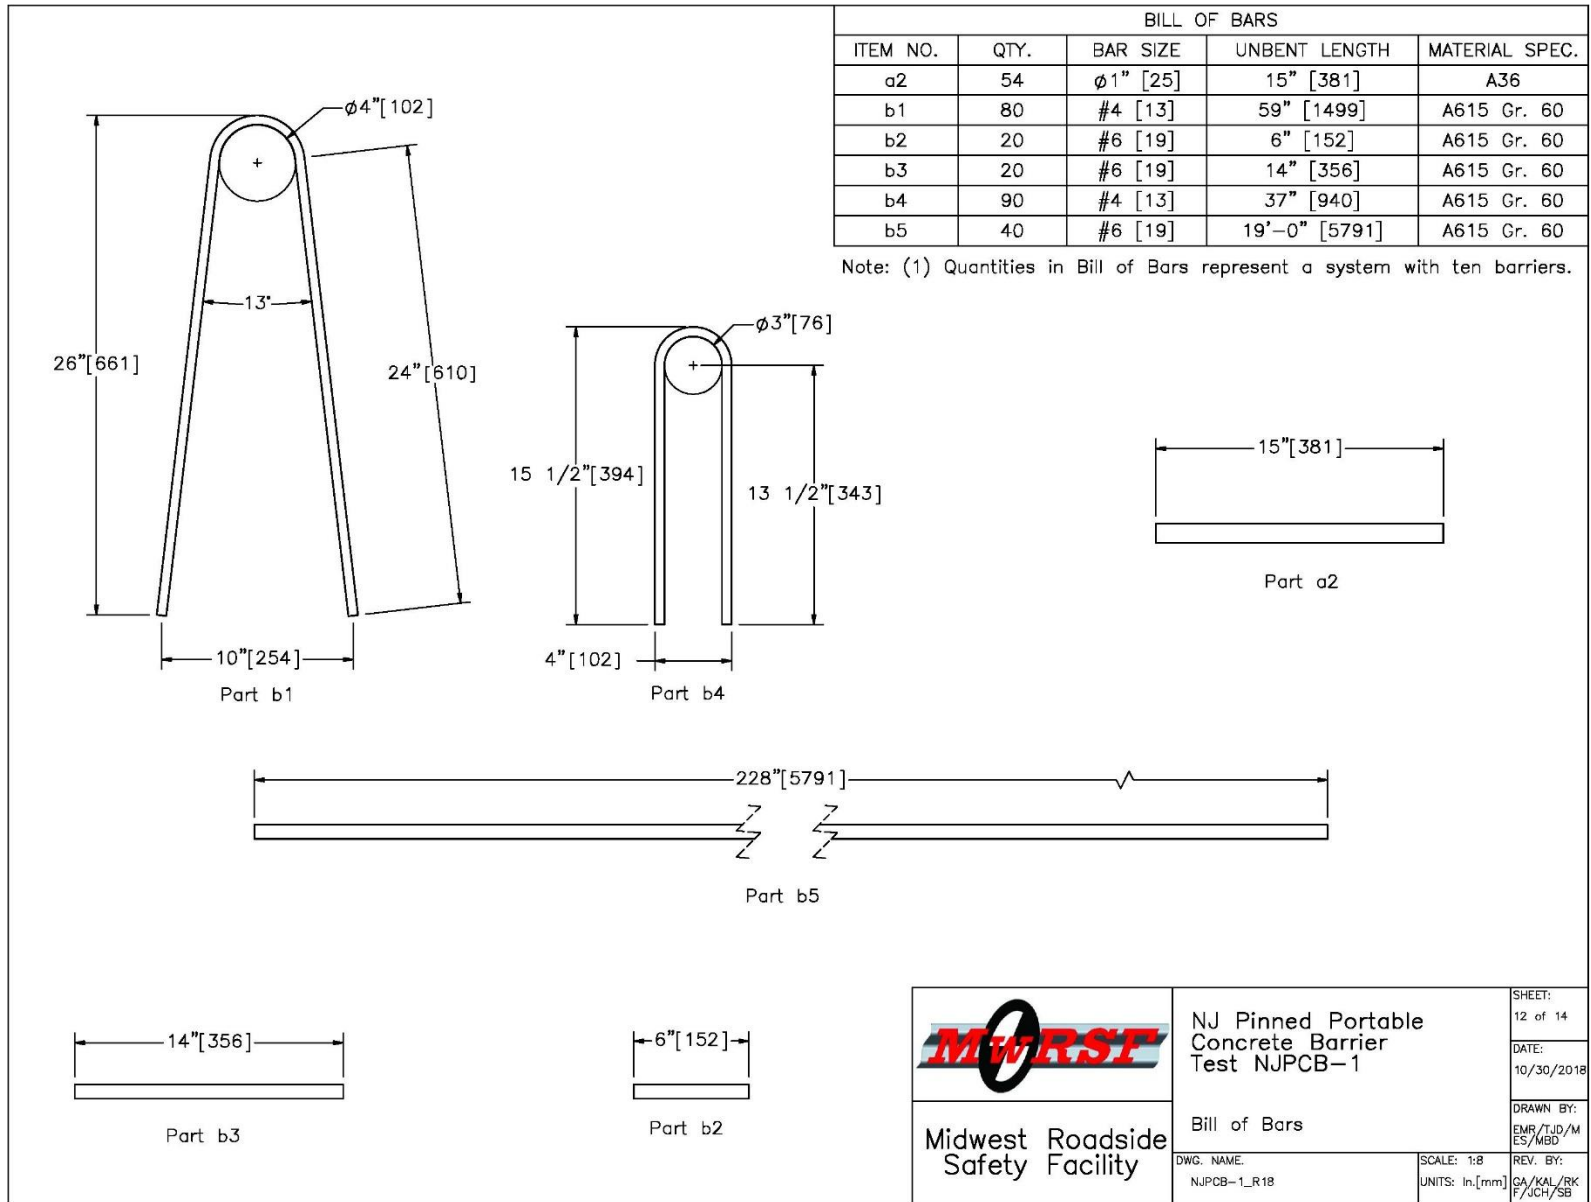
PCB Reinforcement Details, Test No. NJPCB-1
